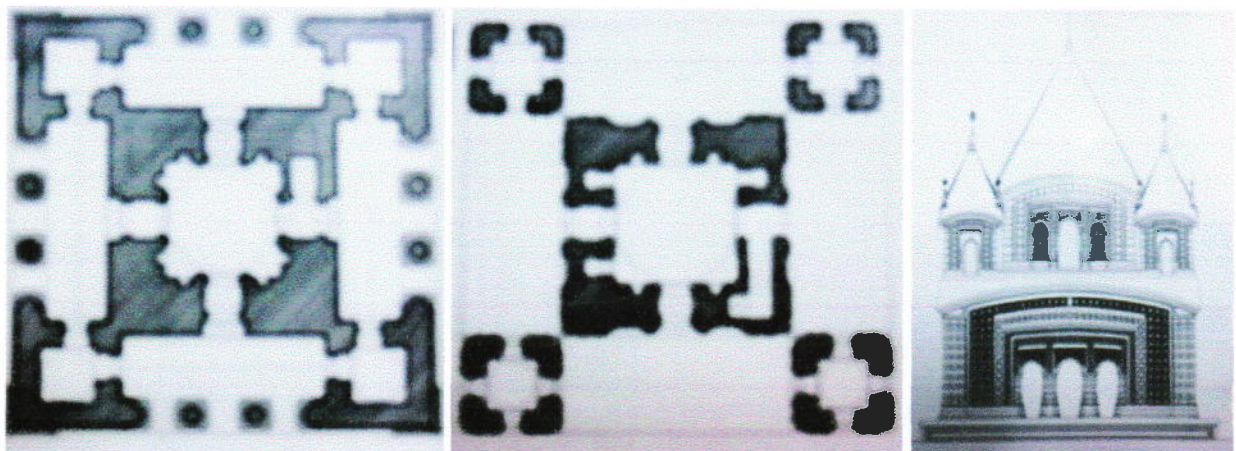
Plans and elevation of Pancha ratna Govinda temple
